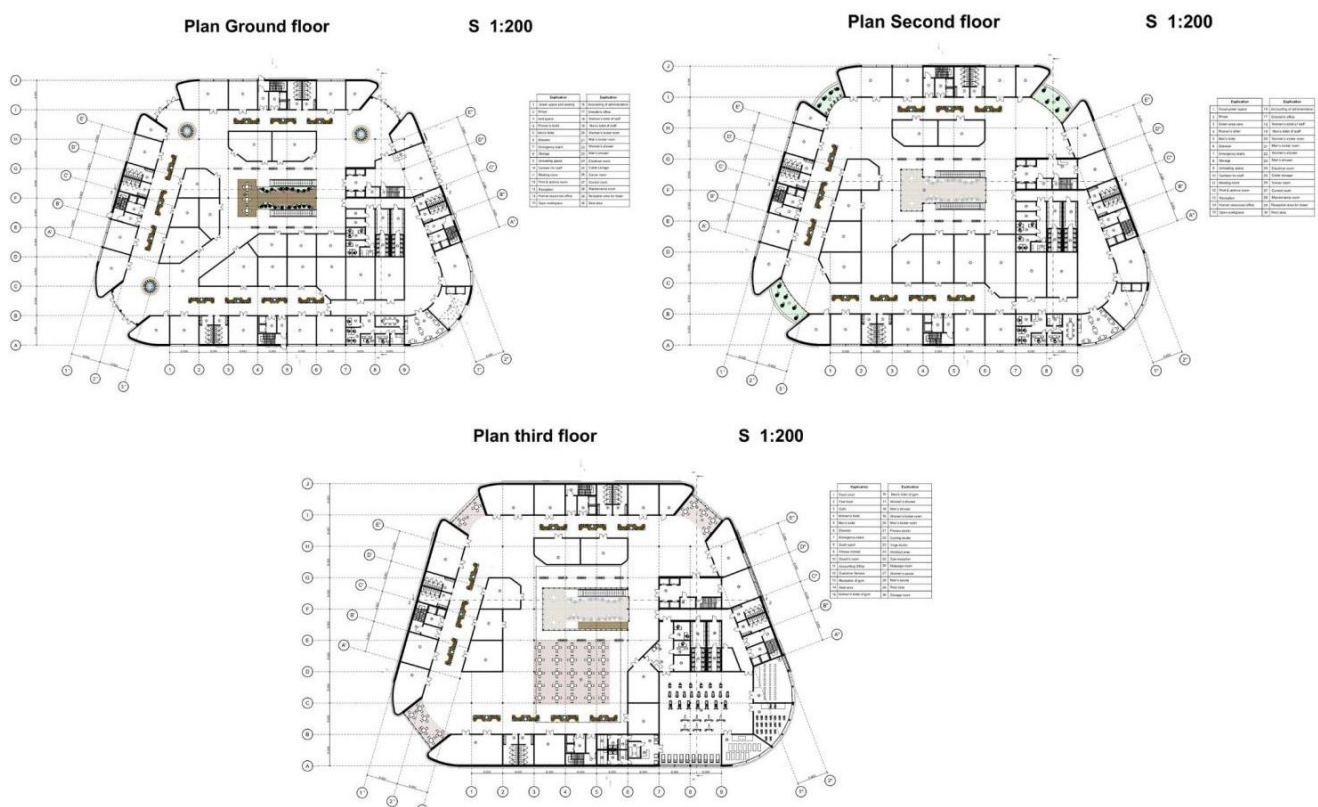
Floor Plans of the Shopping and Administrative Complex
